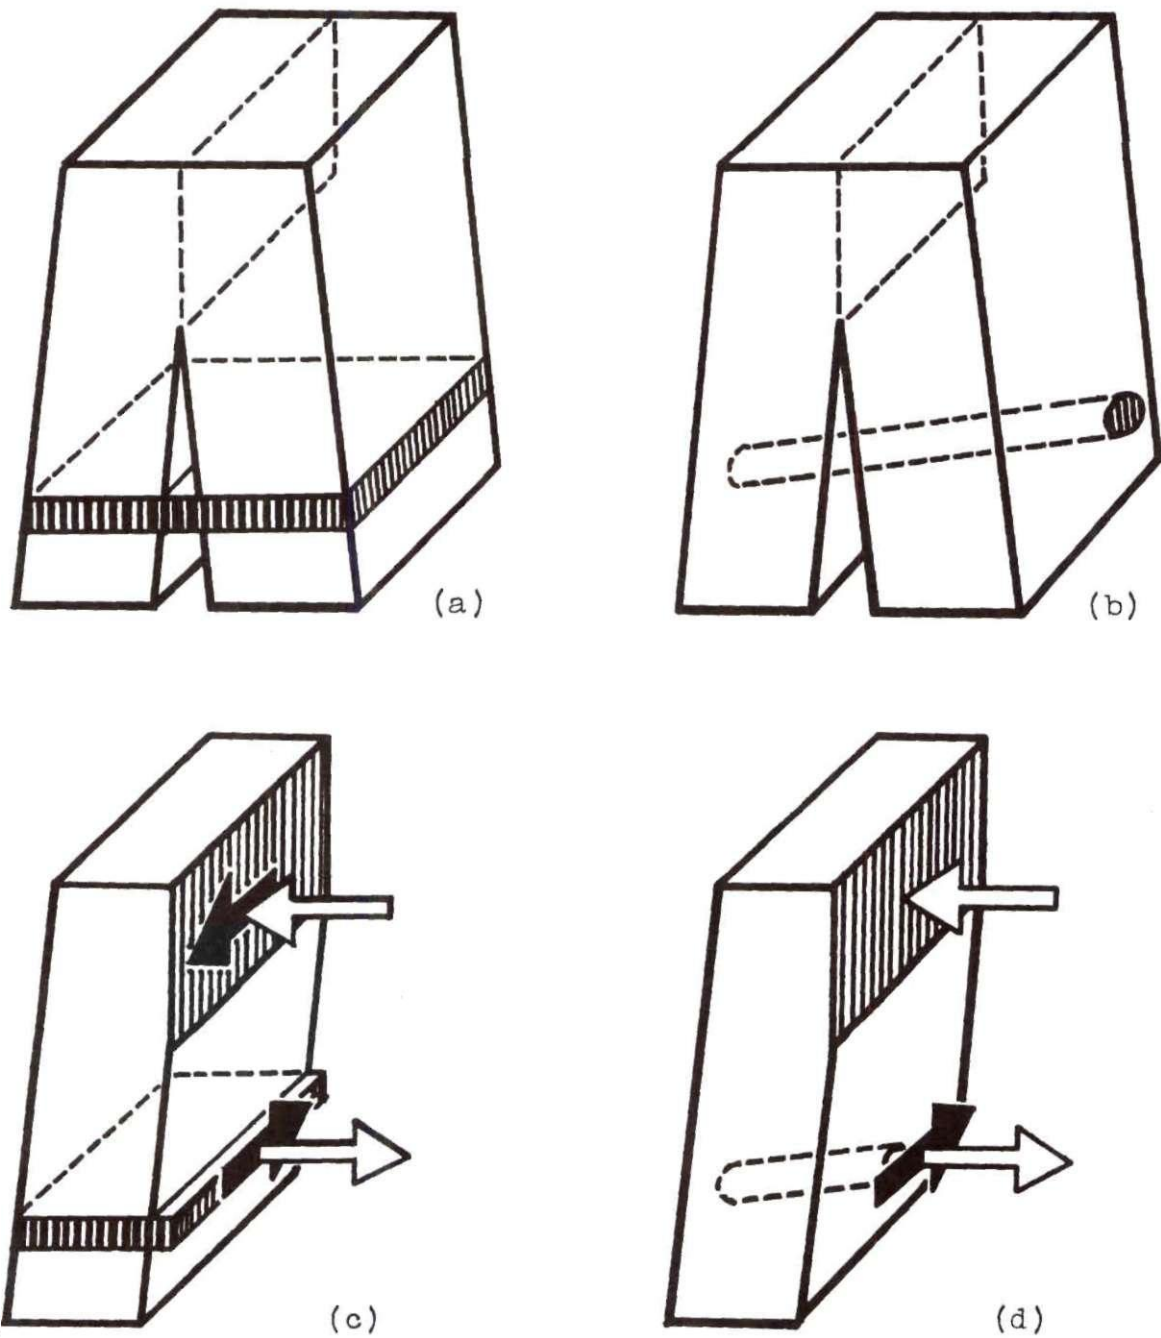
Typical Segment of Orthotropic Slab and of Orthotropically Reinforced Concrete Slab Showing Force Systems.
